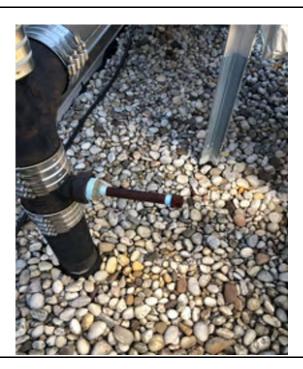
V4 riser and sample port in good condition, facing east. 8 April 2021.
